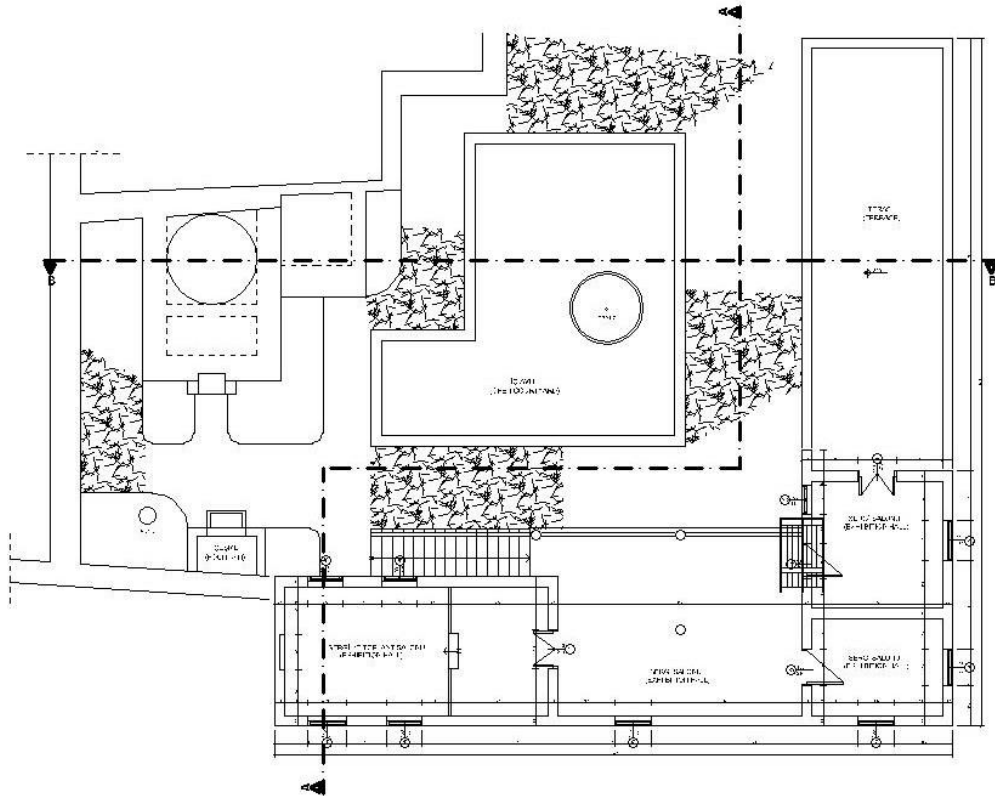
First floor plan of the female part of the Chimney House (Department of Antiques and Museums)
